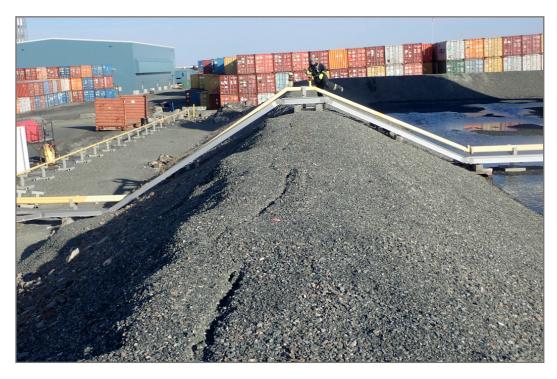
Industrial Fuel Storage Tanks. Cracking on top of berm. Small amount of settlement on crest pipes.
